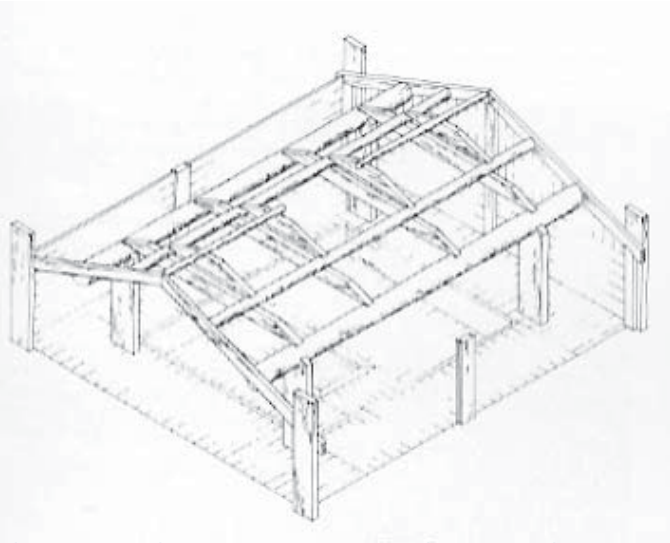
Typical Long House Frame, source: <http://www.shortstreet.net/NA/naplankho.htm>
